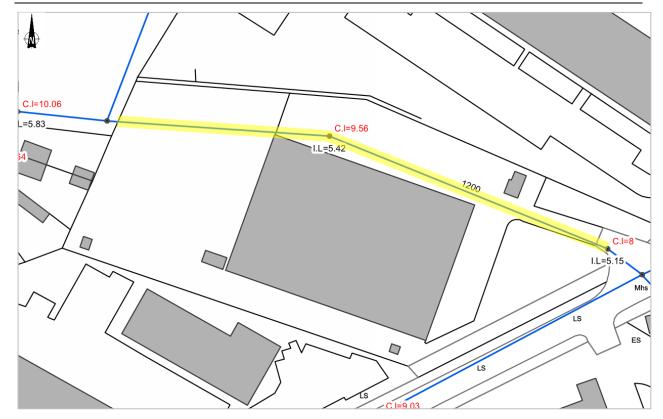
Existing stormwater drainage surrounding the site (Extract from Council records)
